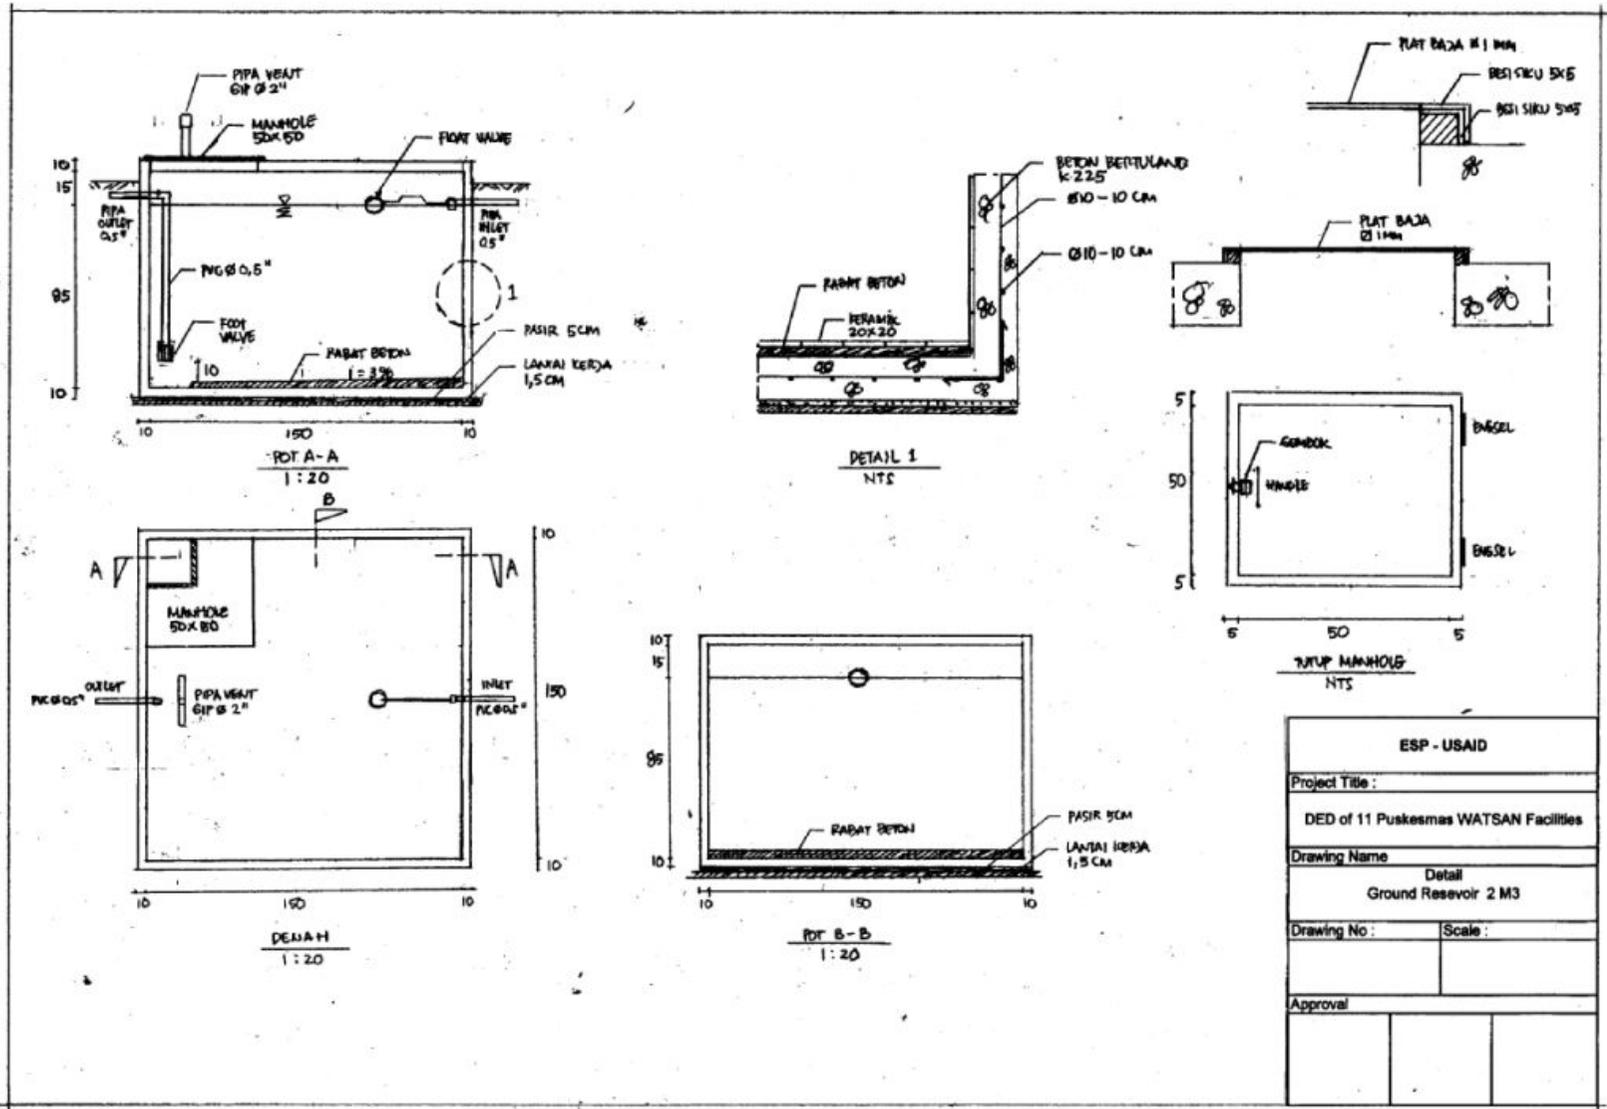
DETAILED ENGINEERING DESIGN OF WATSAN FACILITIES
